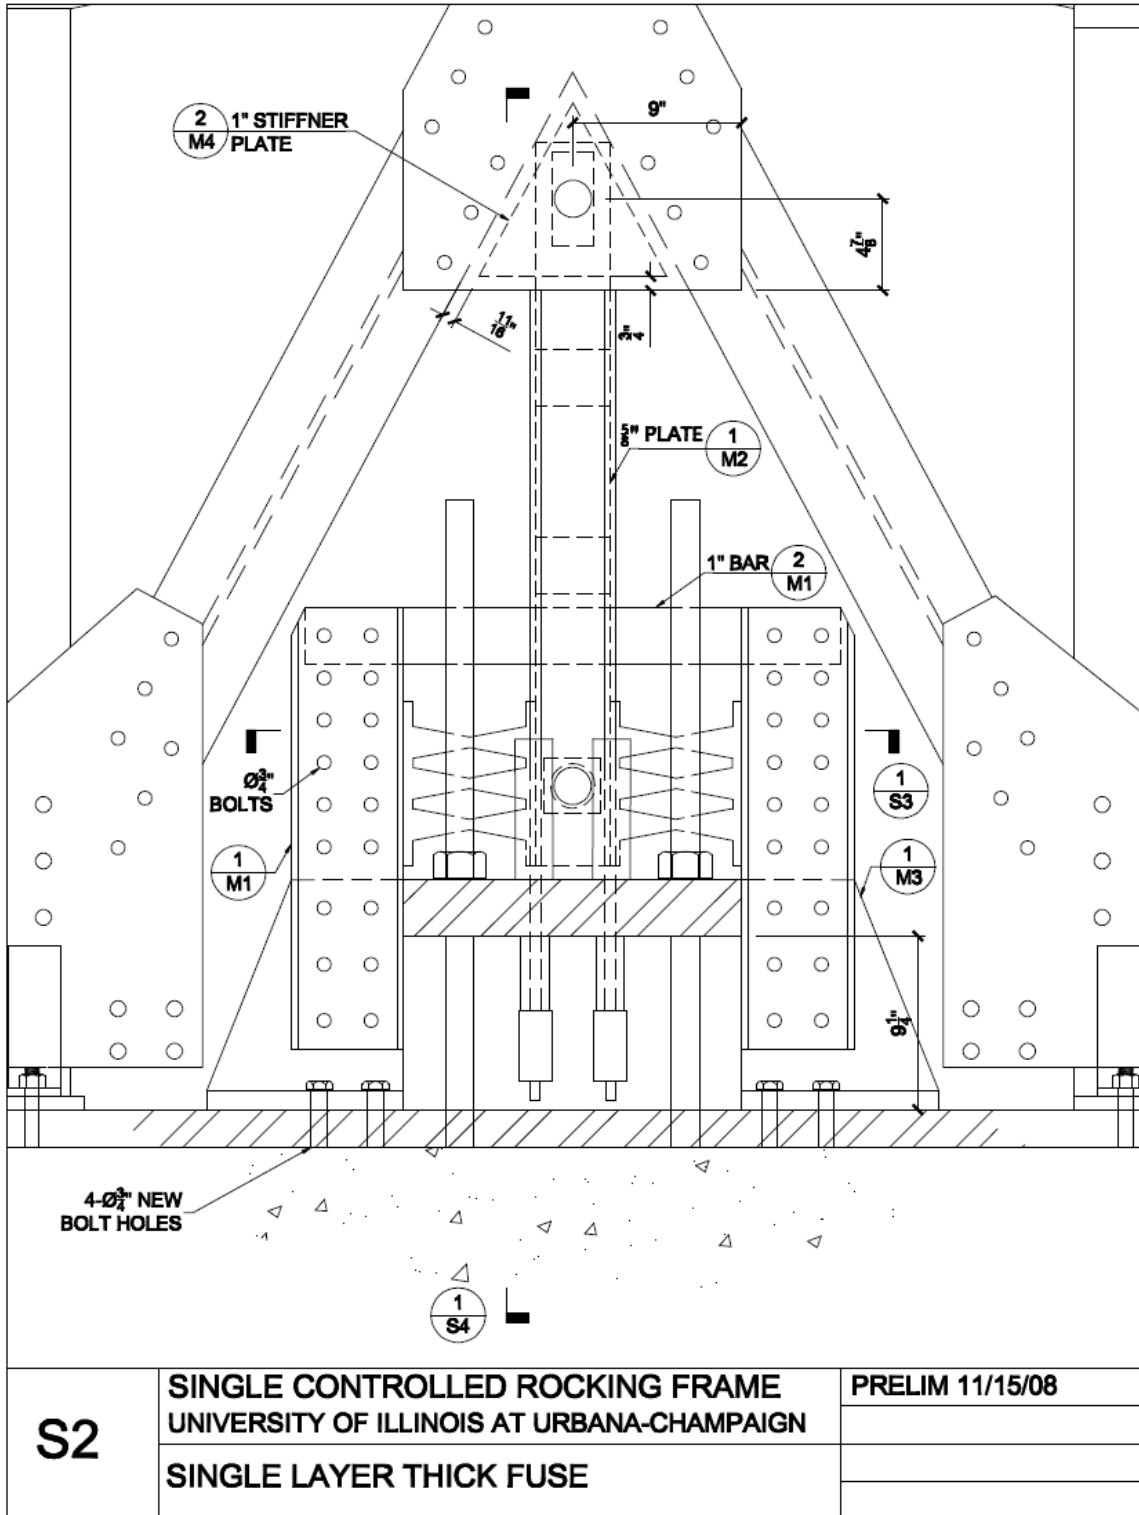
Design Drawing for the Single Frame Configuration – Specimen B1 Close-Up
